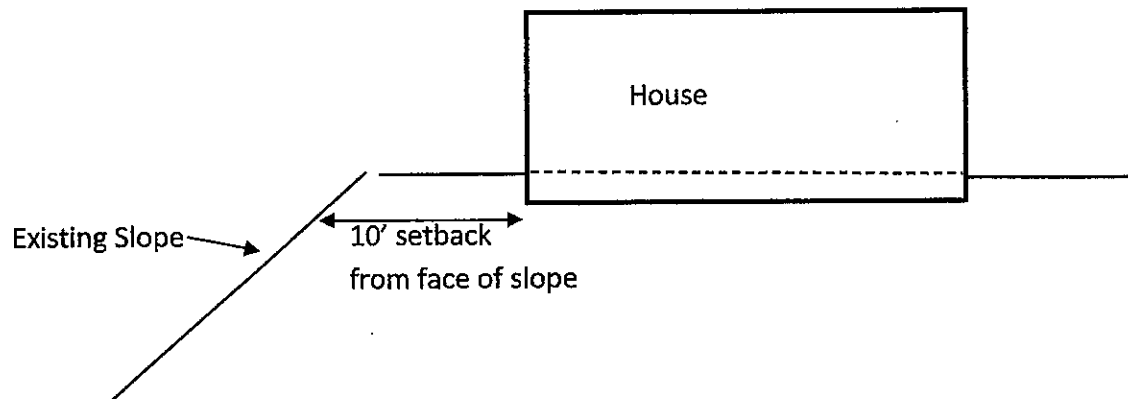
Cross-Section Through Property, Showing Setback from Face of Slope
